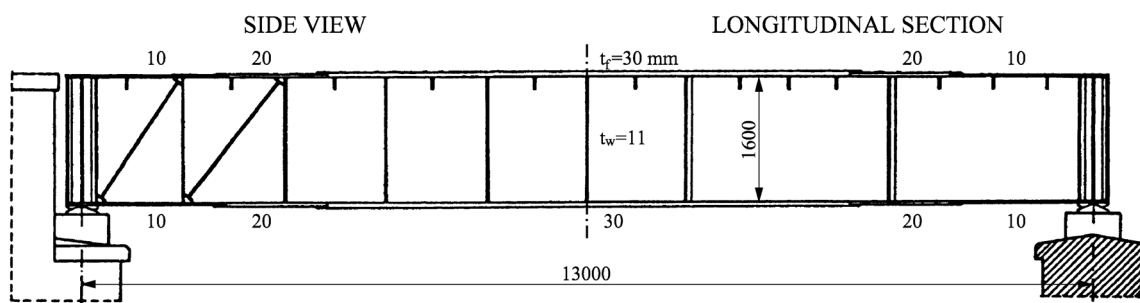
Plate girder for the external spans of the Drwęca river bridge
